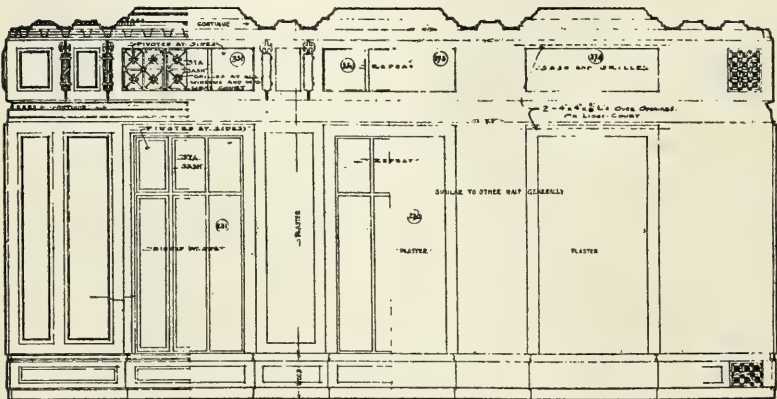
Elevation of room adapted to semi-indirect lighting.
